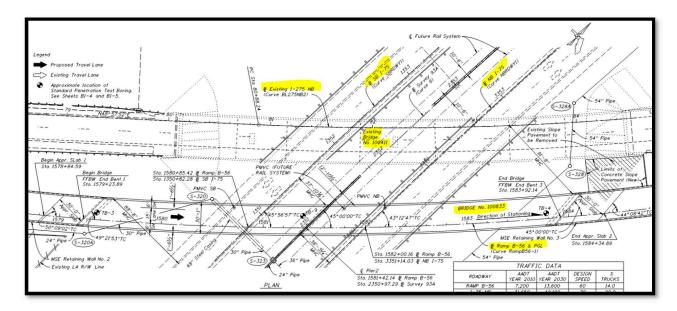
Plan View of Bridge Nos. 100411 and 100833 over I-75
